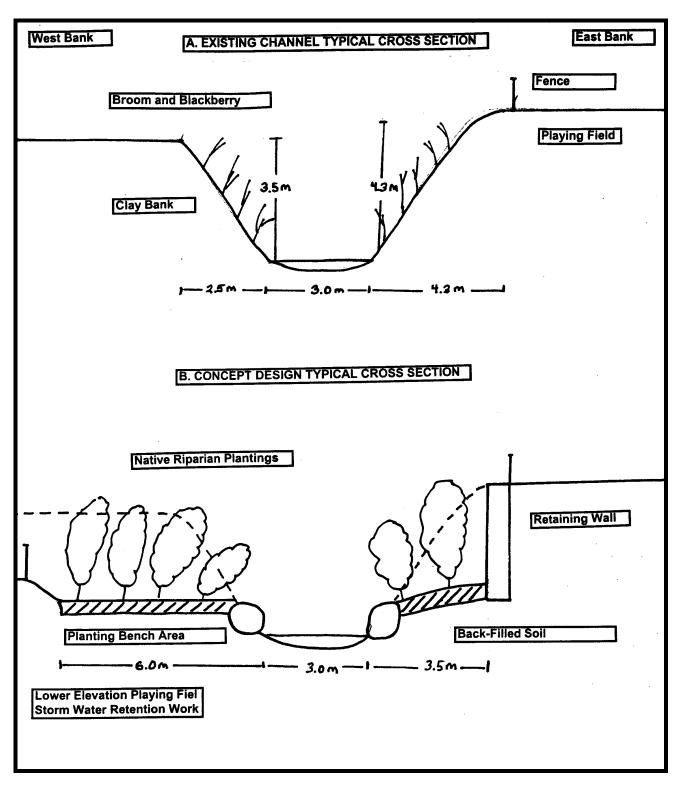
Typical cross section of Bowker Creek in Zone 5 showing concept design for proposed bank reconstruction and riparian restoration work
